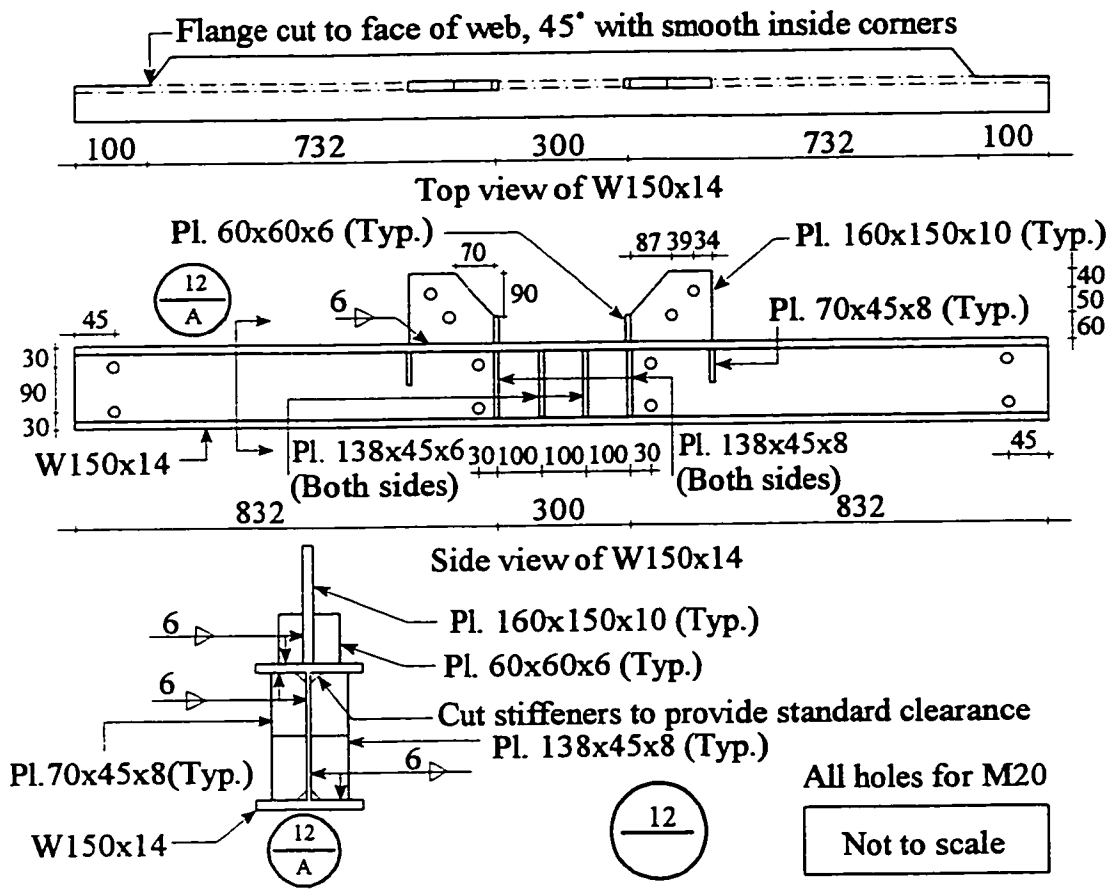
Drawing details for the link beam in the EBF specimen.
